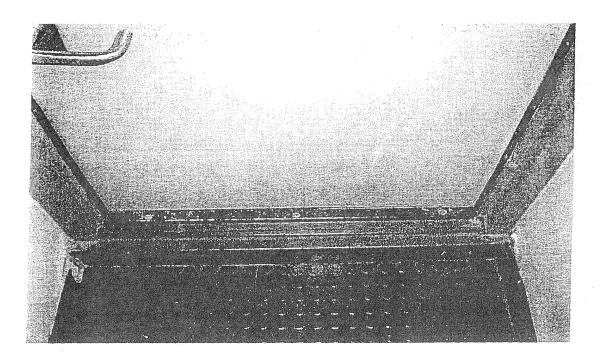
Cab Level, Interior of Door to Outside Walkway.
